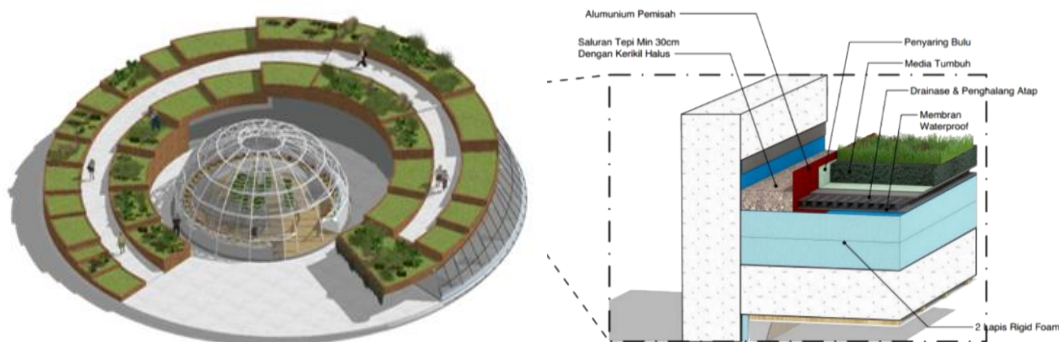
(a) Greenroof area (b) Detail of greenroof layer
